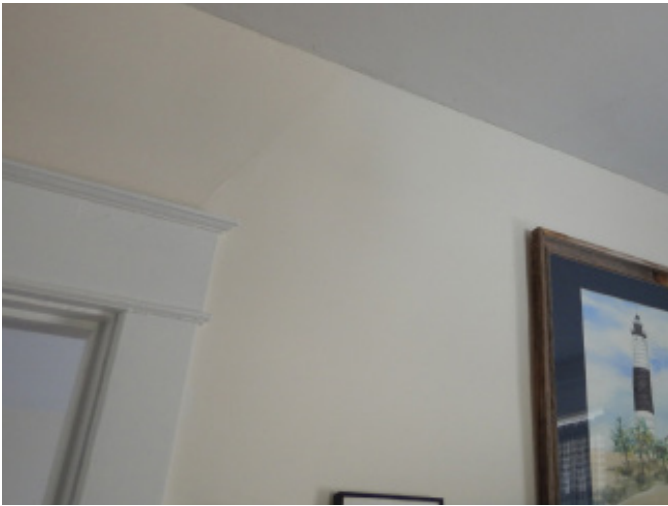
D-54 Cracking in ceiling near center of room and extending up from corner of door.
